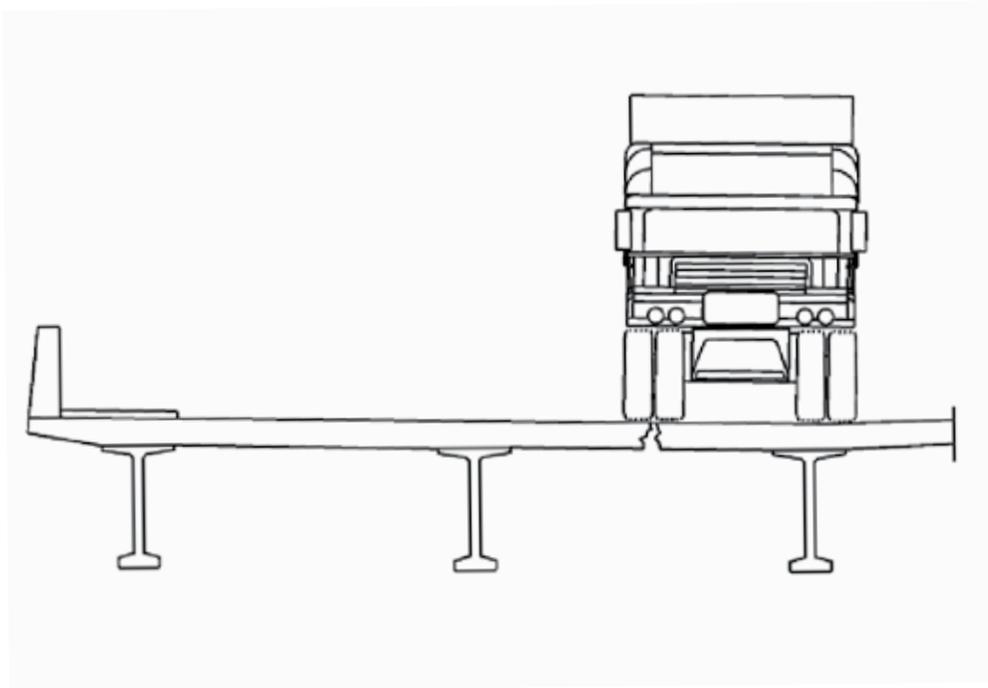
Concrete Roadway Deck Section and Fatigue Location
